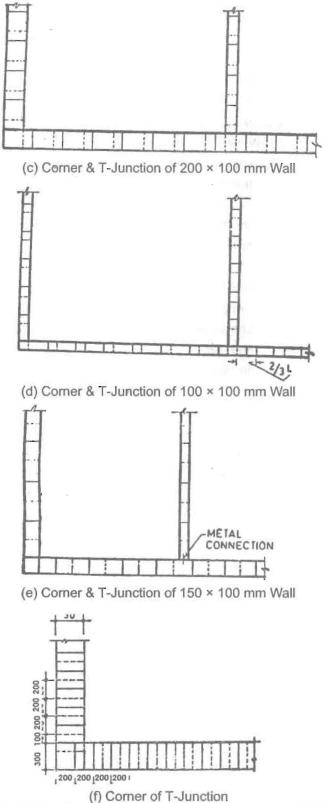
Details of Bonds in Stone Masonry Block Walling
